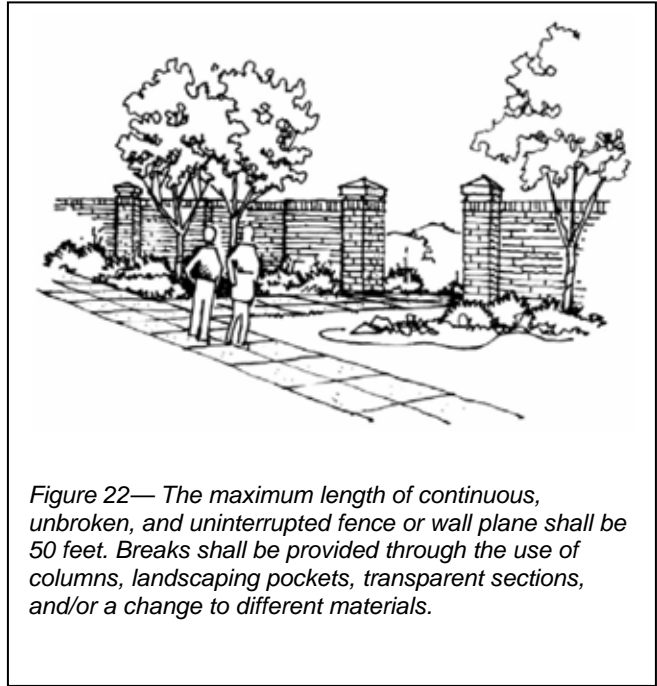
The maximum length of continuous, unbroken, and uninterrupted fence or wall plane shall be 50 feet. Breaks shall be provided through the use of columns, landscaping pockets, transparent sections, and/or a change to different materials.
